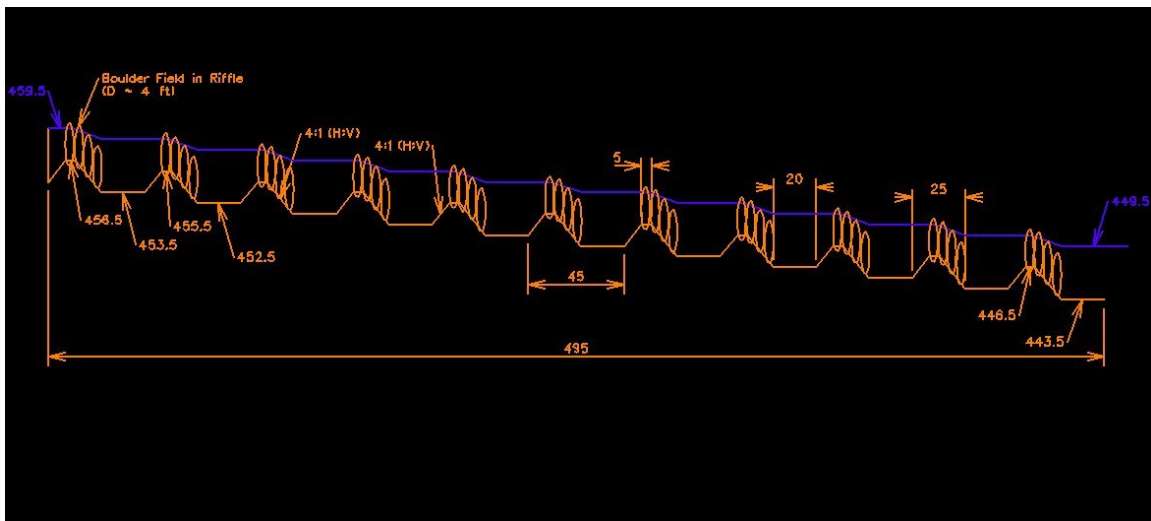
Conceptual drawing of down-stream rock ramp proposed for the Intake Dam. This drawing is the actual design proposed for Lock and Dam 22, St. Paul District, U.S. Army Corps of Engineers.
